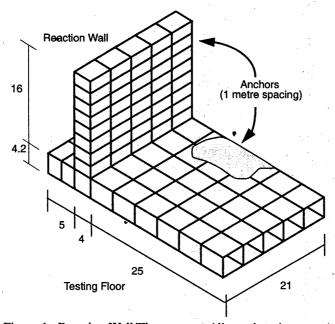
Reaction Wall/Floor system (dimensions in metres)
